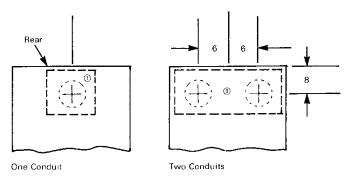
Fig. B — For Entrances Into Cable Enclosure (Or Cable Enclosure Area)
